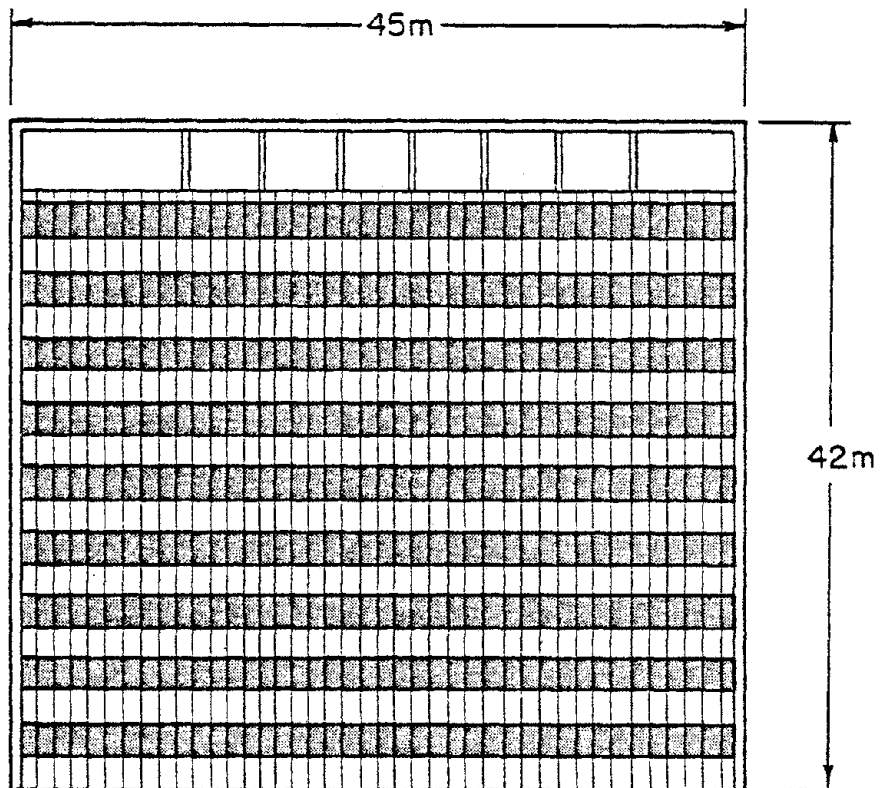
Elevation View of the British Rail Building in the Long Direction.
